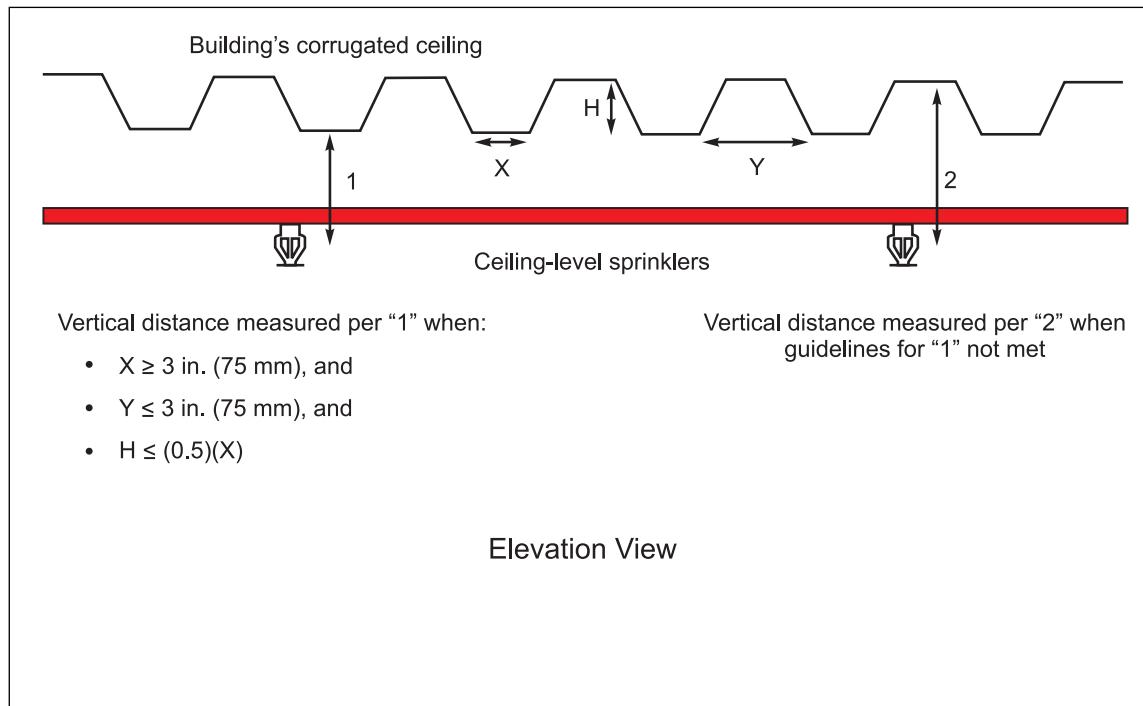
How to measure the vertical distance between the thermal element of Nonstorage pendent and upright sprinklers and the underside of a corrugated ceiling
